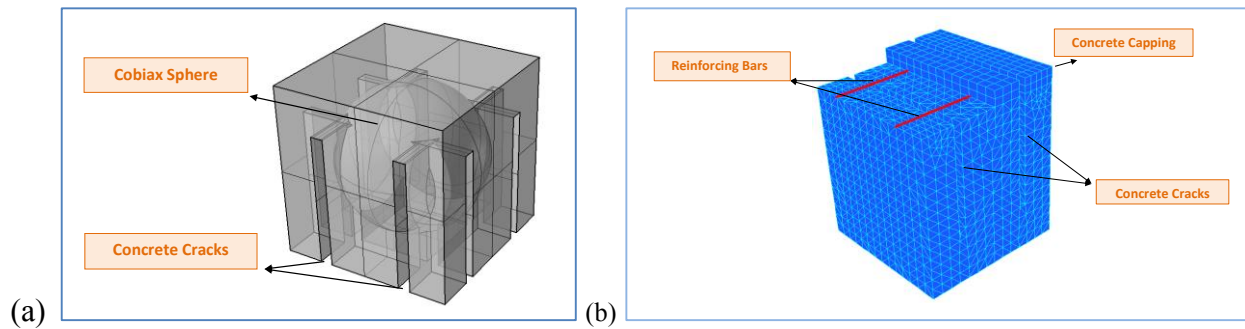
(a) cracked wireframe concrete section with a Cobiax sphere (b) cracked solid concrete section
